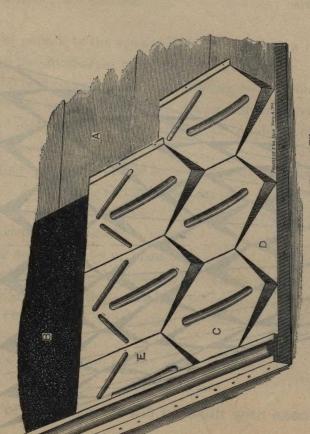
Section of Roof covered with Hexagon Tiles.
